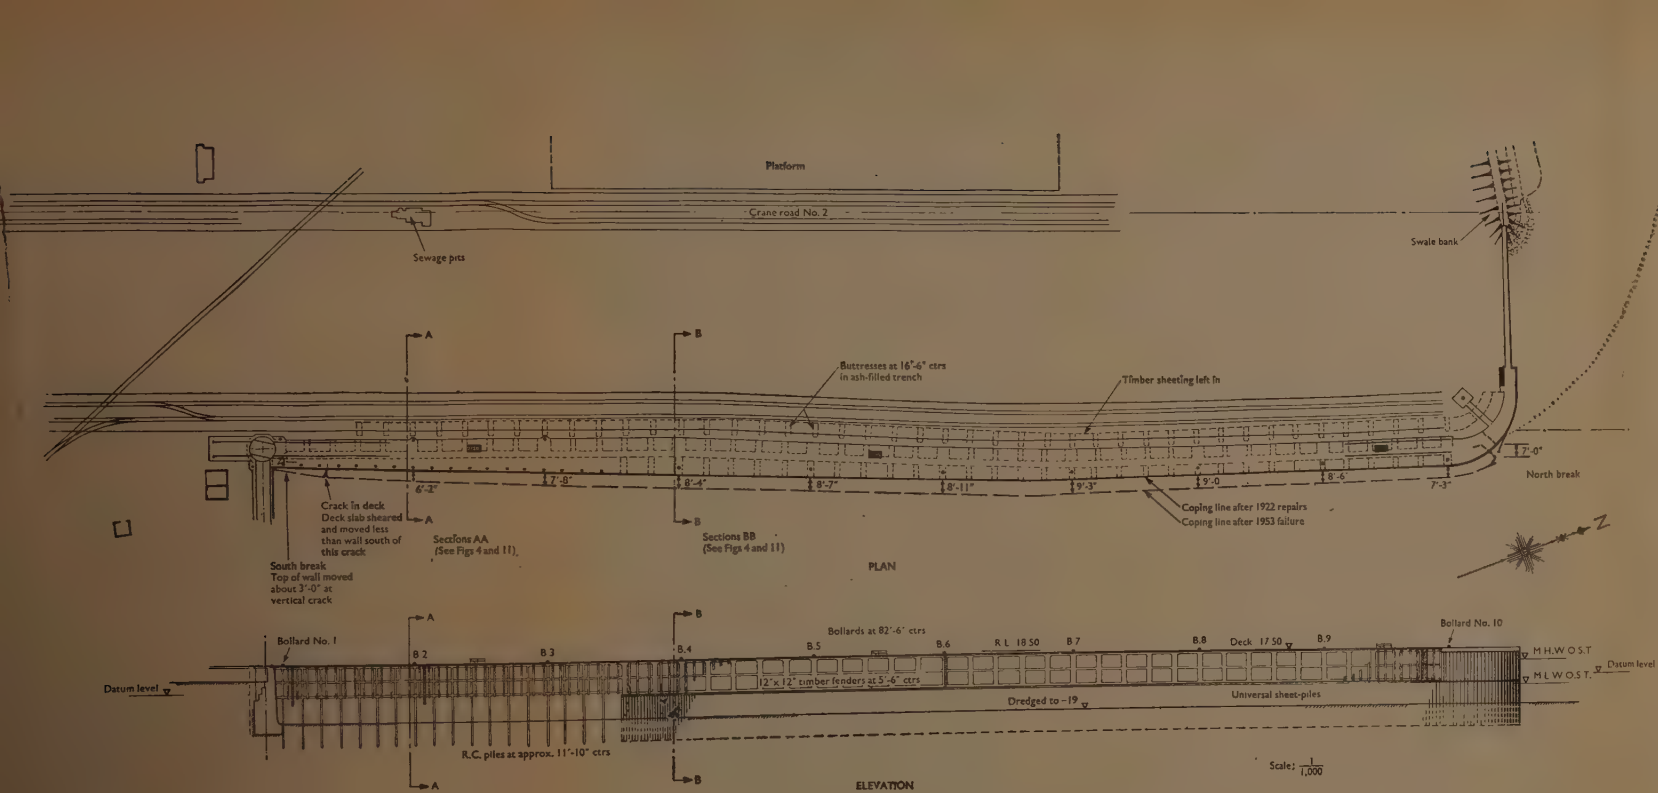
WEST WALL AFTER 1922 REPAIRS AND MOVEMENT DUE TO 1953 TIDAL FLOOD
